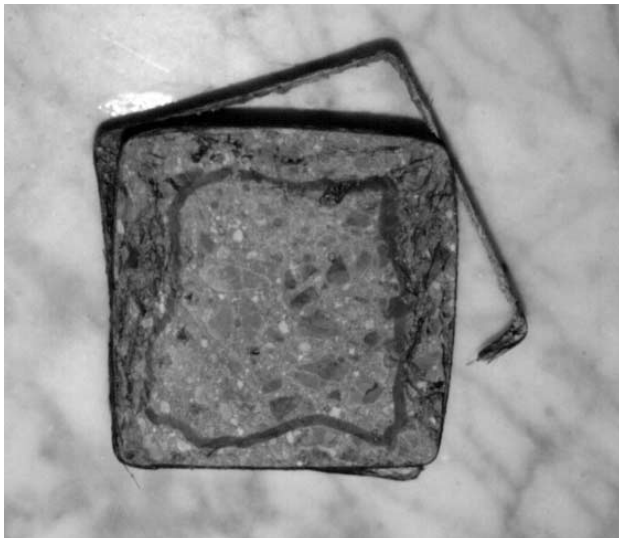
Transverse cross-section of compressed concrete members with square section confined with FRP at failure [13].
